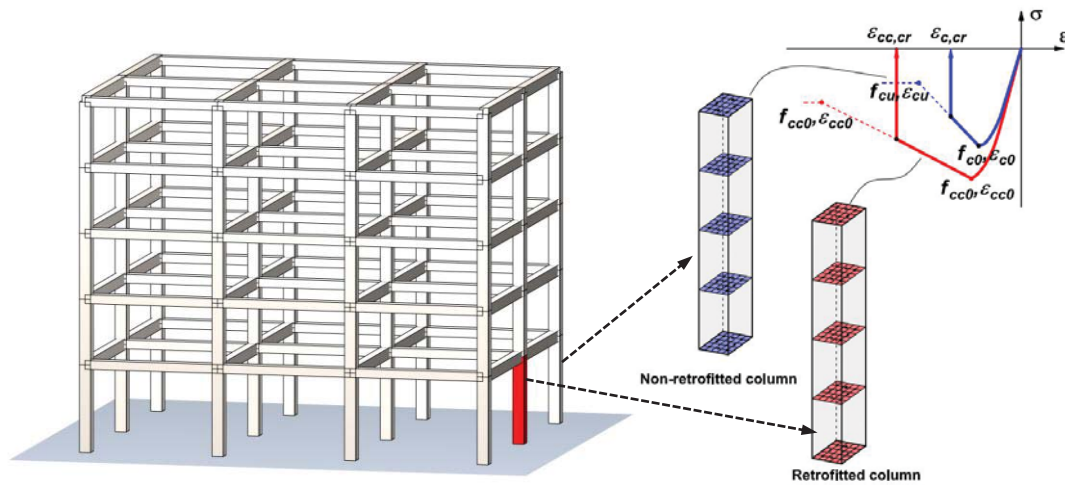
Definition of the frame fiber-section elements with and without steel-jacketing reinforcement.
